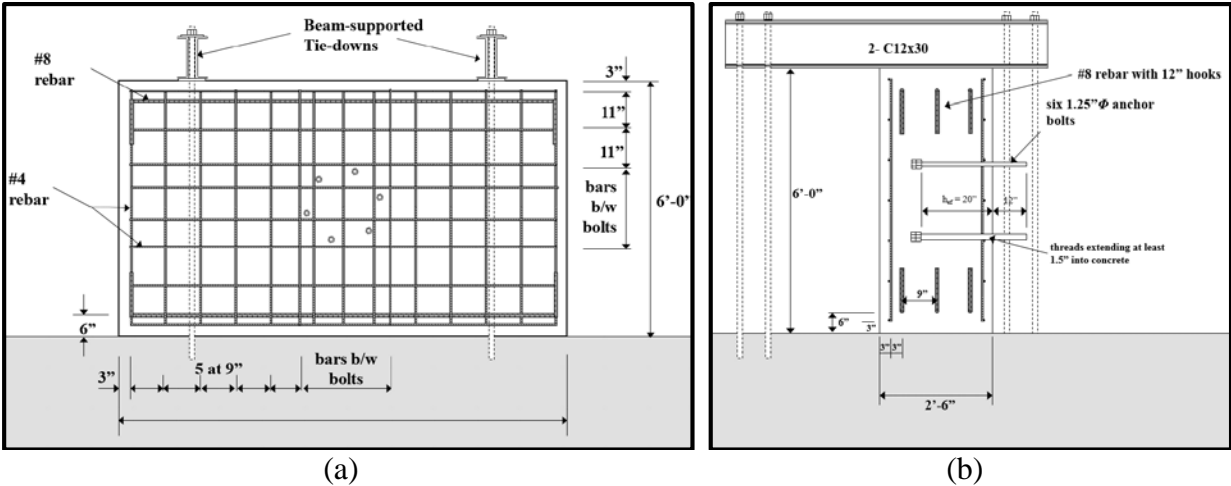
Front (a) and side (b) views of anchor placement details for test specimen blocks
